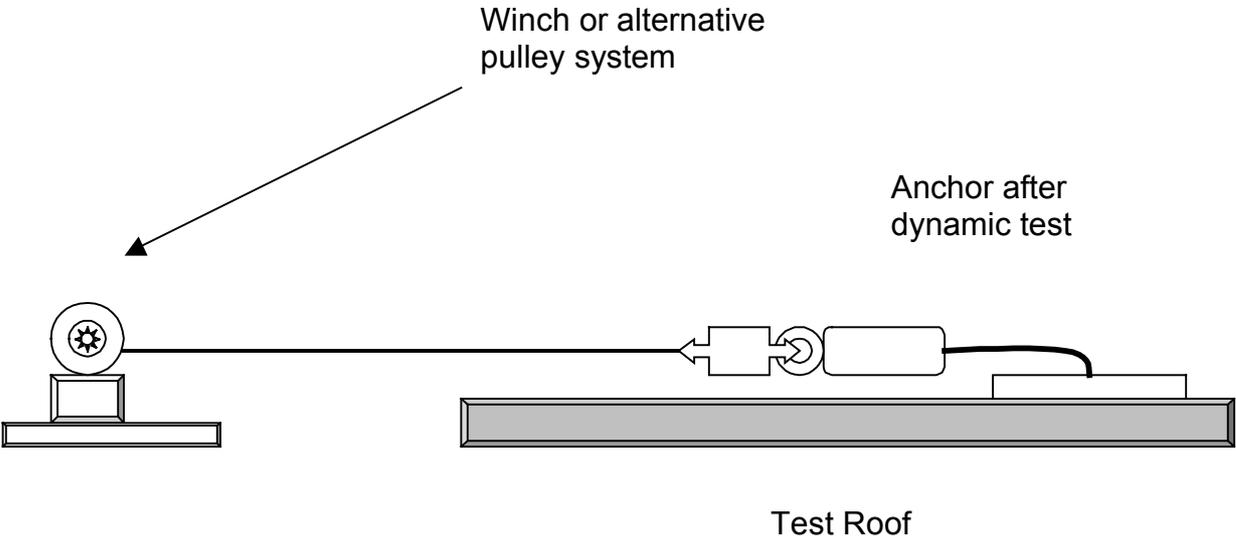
STATIC TEST ARRANGEMENT - TYPICAL
